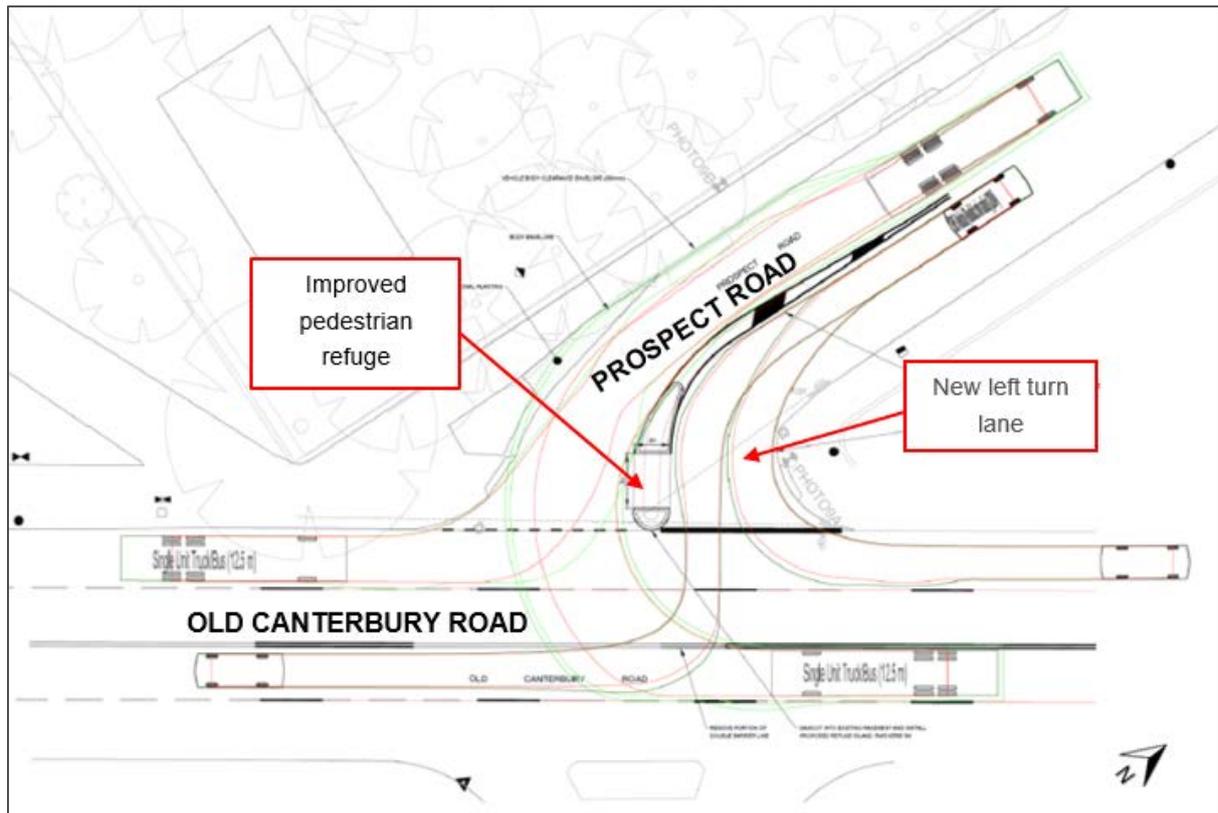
| Mitigation measures proposed by Applicant at Prospect Road / Old Canterbury Road intersection (Source: Applicant's SRtS 2021)
